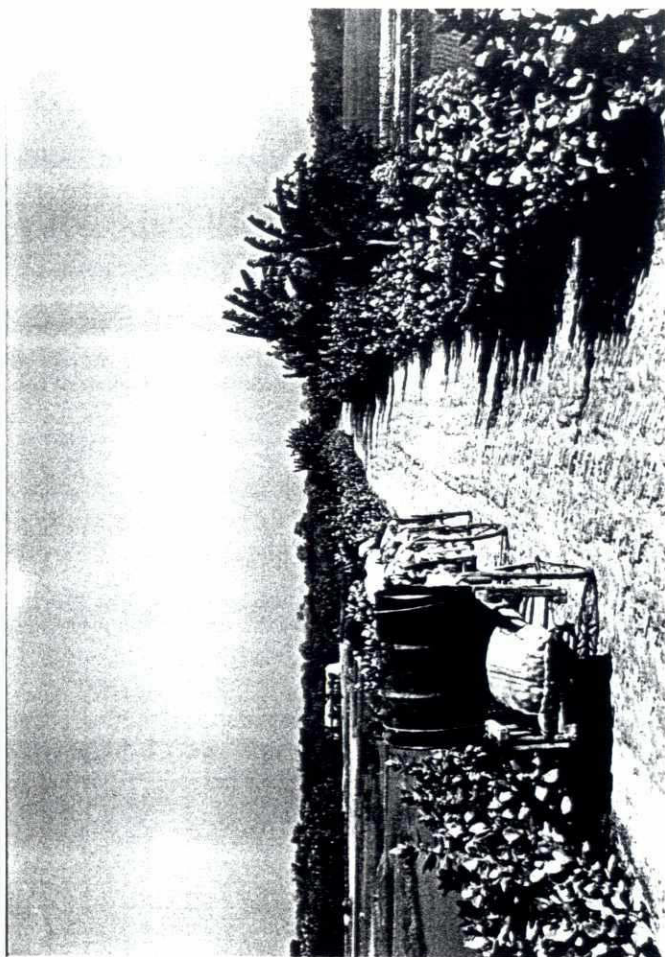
Retired CIP western embankment at Chandra Union, looking north, area to west requires flood-proofing, March 1998.
